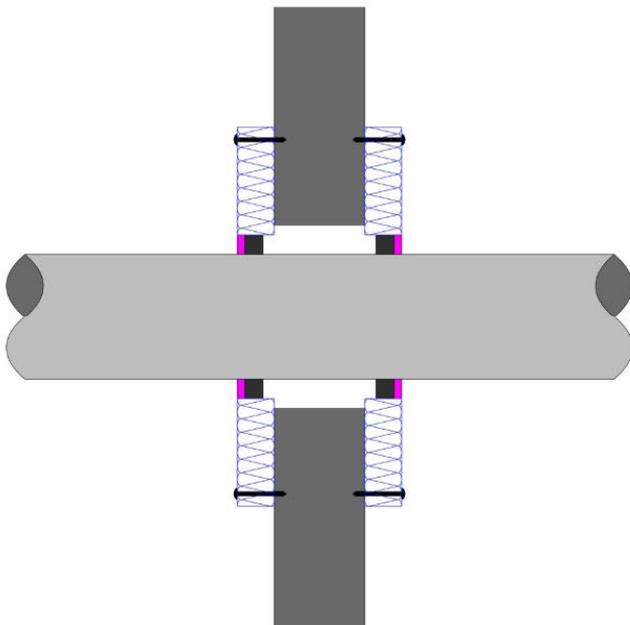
Typical installation of pipes fitted perpendicular to wall with two layers of BOSS Batts pattress-fitted in aperture and BOSS UniWrap on both faces
